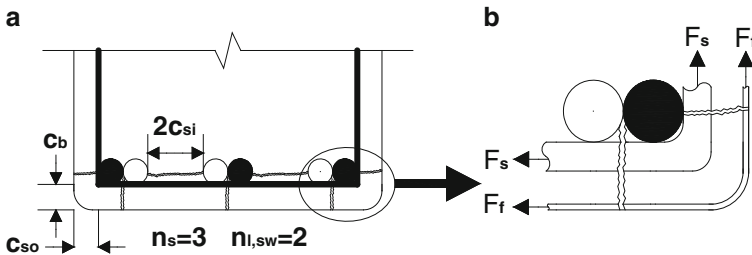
(a) Definition of c_b , c_{si} and c_{so} . (b) Forces induced by stirrups and TRM or FRP jackets against side and face splitting cracks
